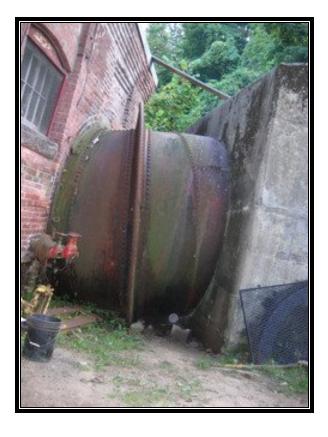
View of the above ground steel penstock looking upstream from the powerhouse.
